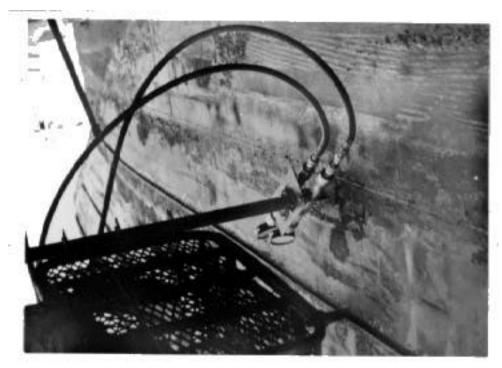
SERVOJET Array Shown Mounted on Basket of "High Reach" Machine
